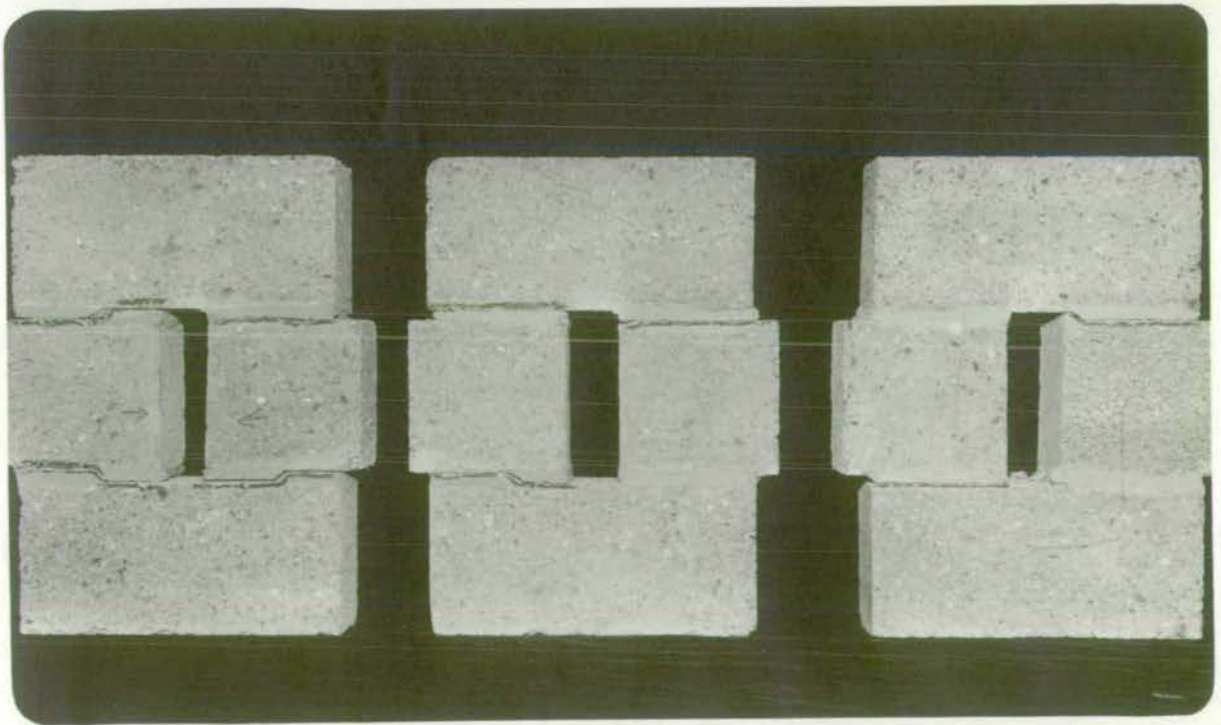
BLOCKWORK TRIPLETS AFTER FAILURE
